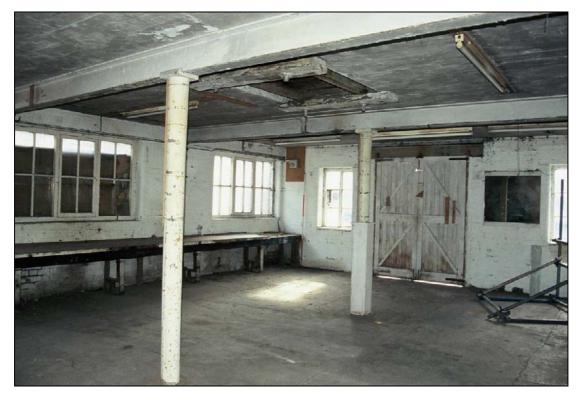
General view of F4, north range – note workbench, column and loading door (film C/S 2.9)
